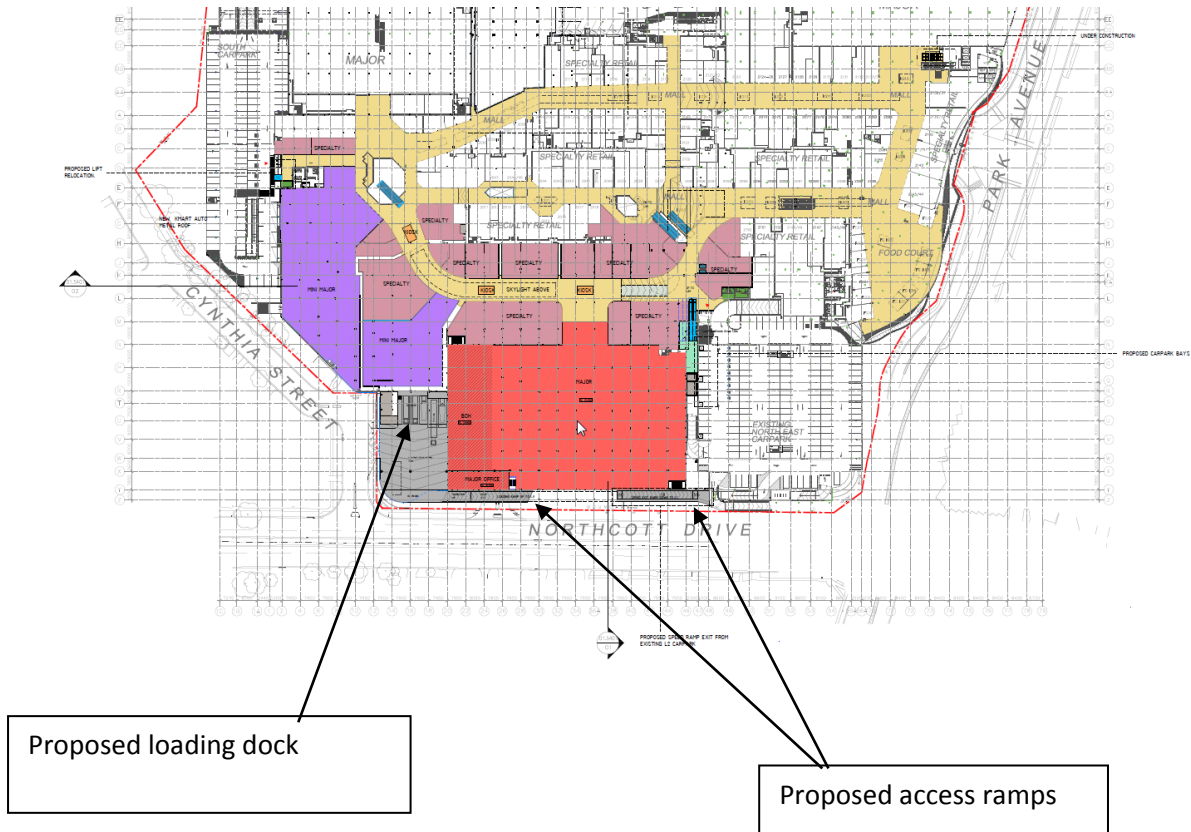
Site Location, including proposed changes to the loading dock and entry ramps, Level 2
